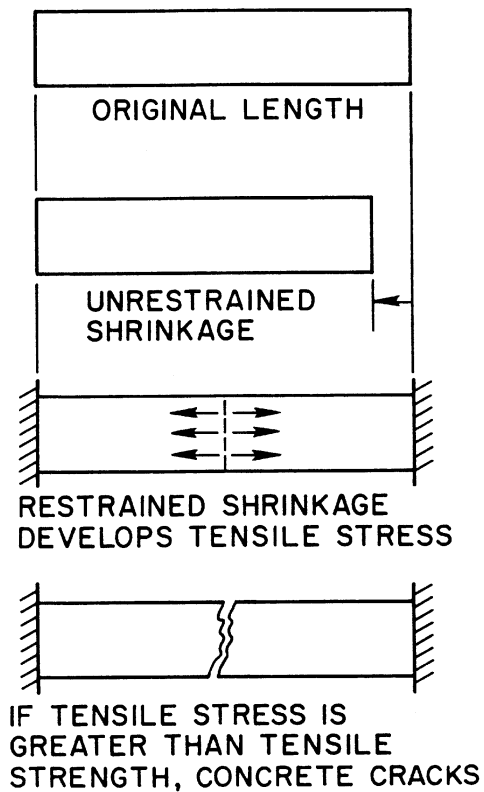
Cracking of concrete due to drying shrinkage.
